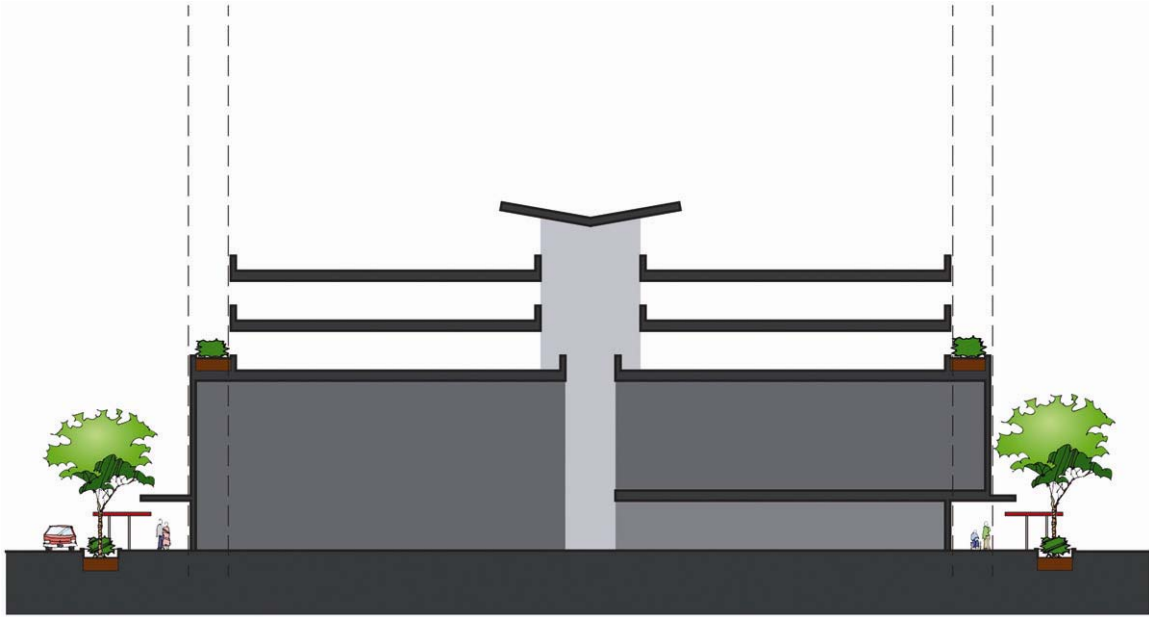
Transit facilities integrated into perimeter at ground floor of full block redevelopment scheme. (Cross-sectional view also shows elevated parking and an internal atrium for ventilation and natural light). Source: FAU Broward Community Design Collaborative, Alex McManus and Anthony Abbate (2009).
